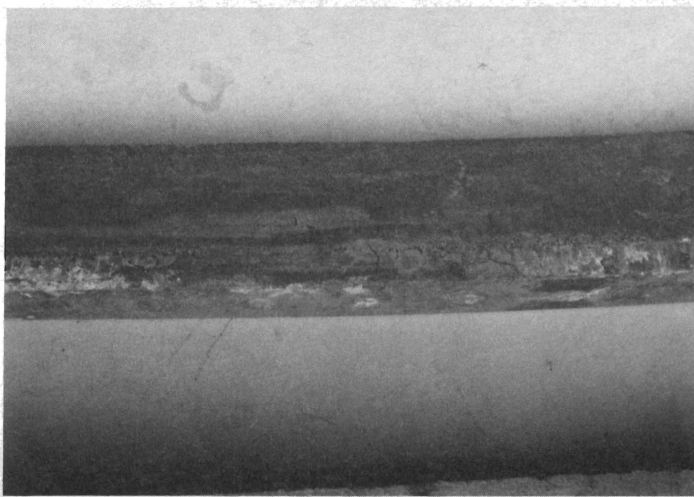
TYPICAL FAILURE PATTERN FOR BENDING TEST SPECIMENS
